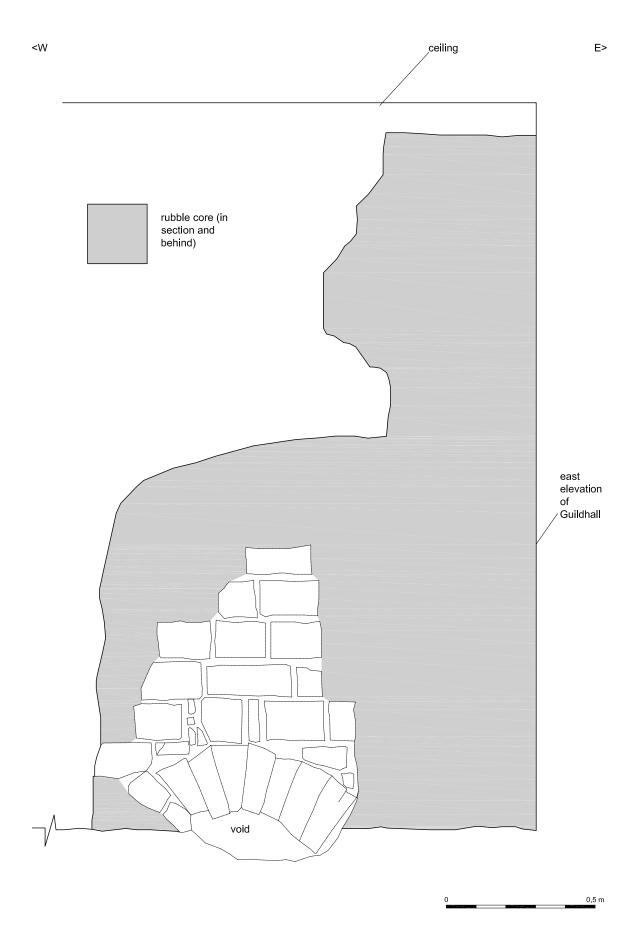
Elevation of masonry soakaway arch and vault in Phene Neal Room, looking south
